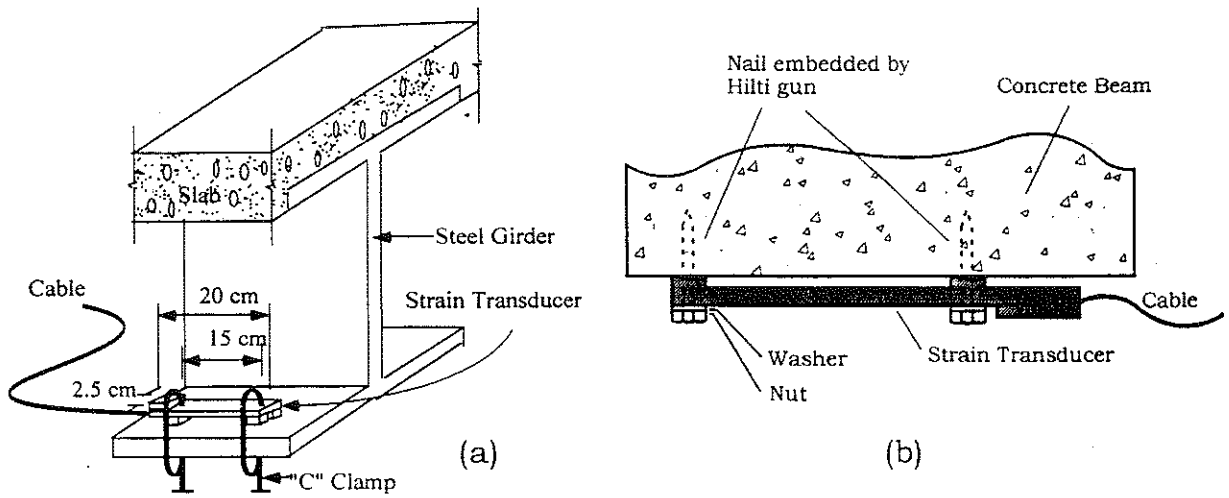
Demountable Strain Transducer Mounted to the Lower Flange and Concrete Beam..
